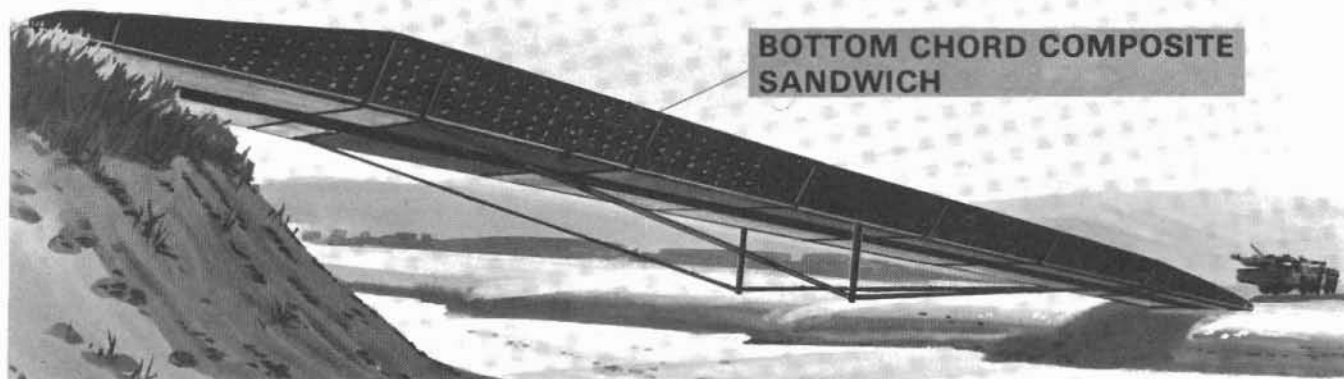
Test bed bridge showing location of bottom chord sandwich panel and bridge reinforcement system.
